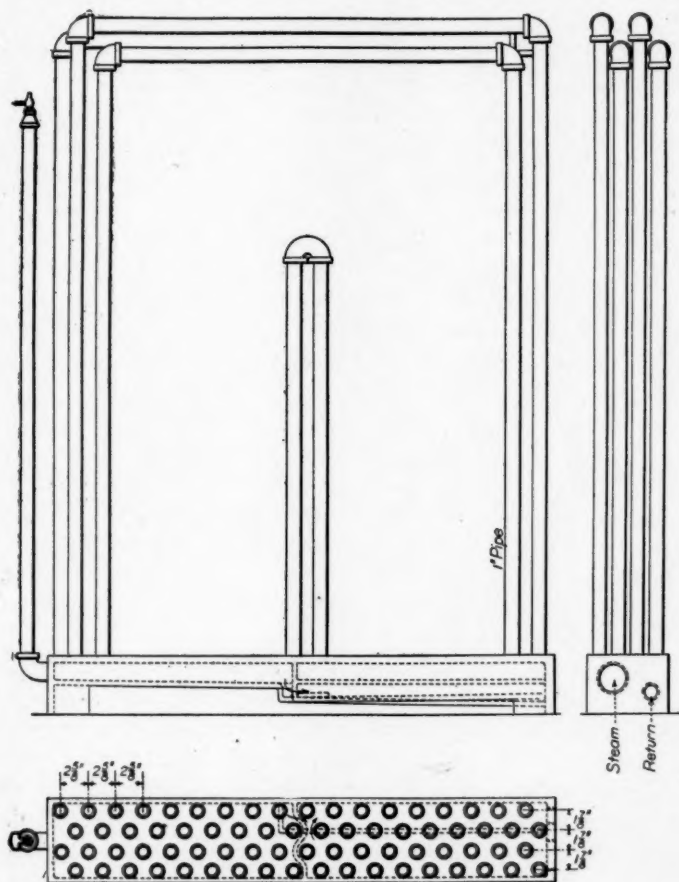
DETAIL OF HEATER CONSTRUCTION.
